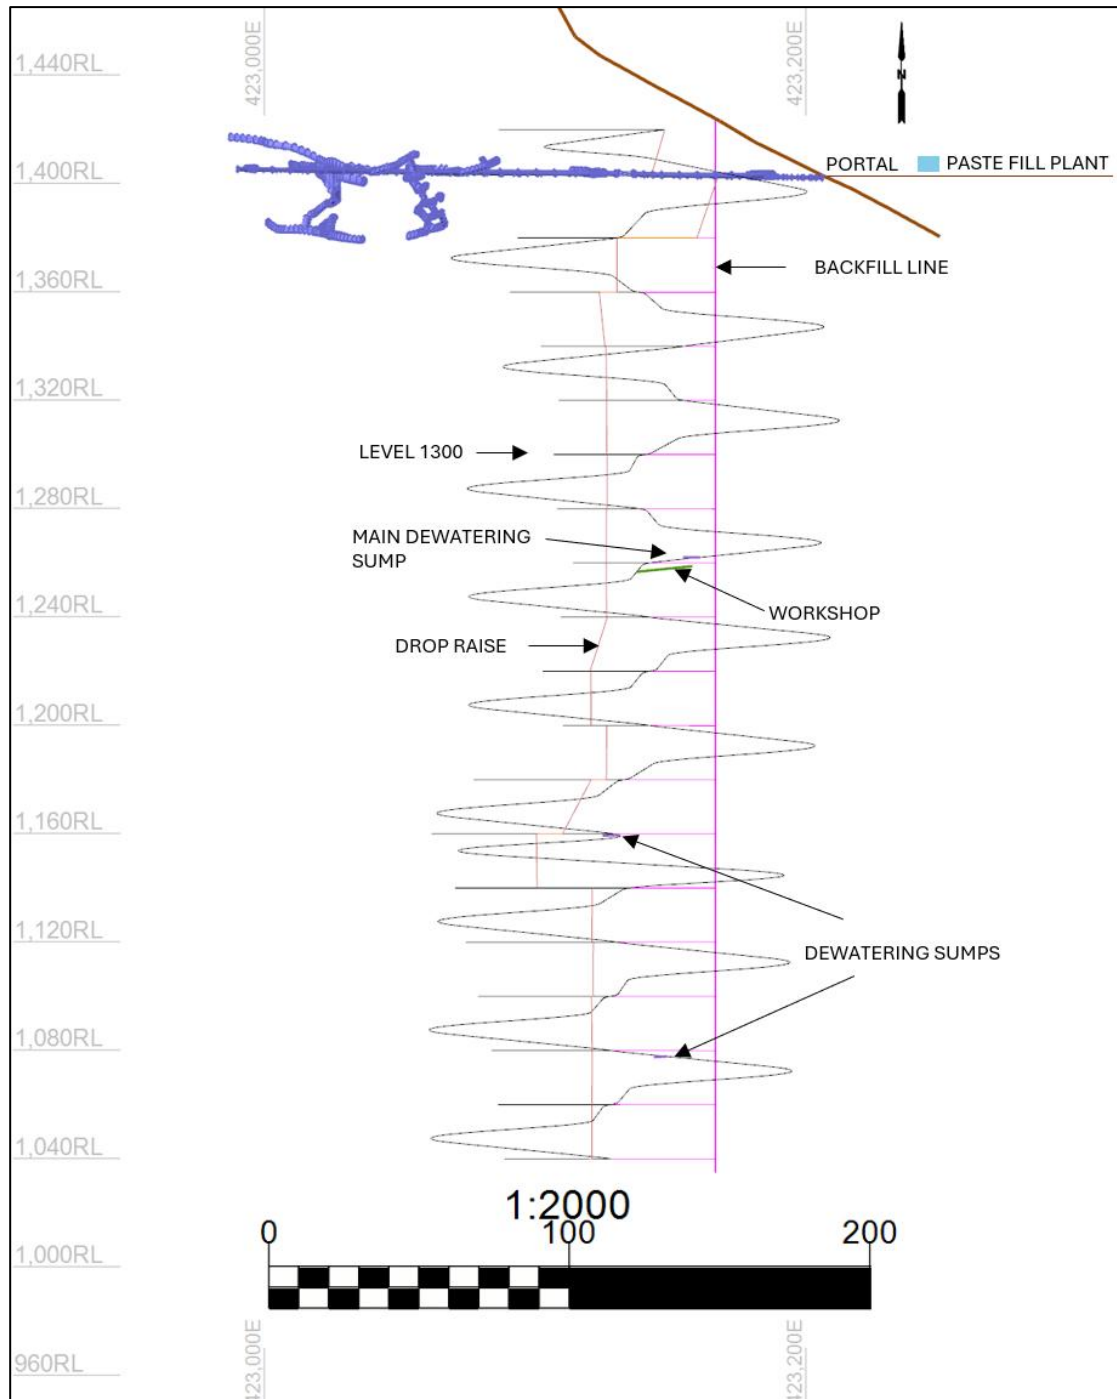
, 16-7, and 16-8 illustrate the underground mine designs, including stope shapes and development to access the stopes.
